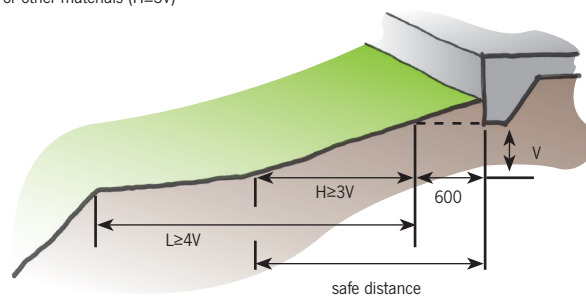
Minimum separations between the bottom of a building's foundation and an adjacent bank (developed from Figure 3.1 in NZS 3604:2011).
